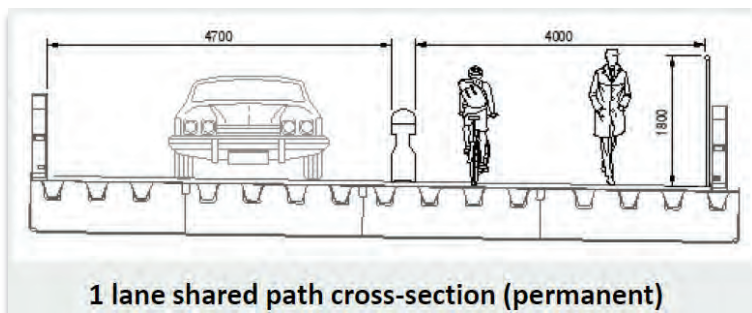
Schematic 'Option 3' cross section, 4.7m lane width maximum.
